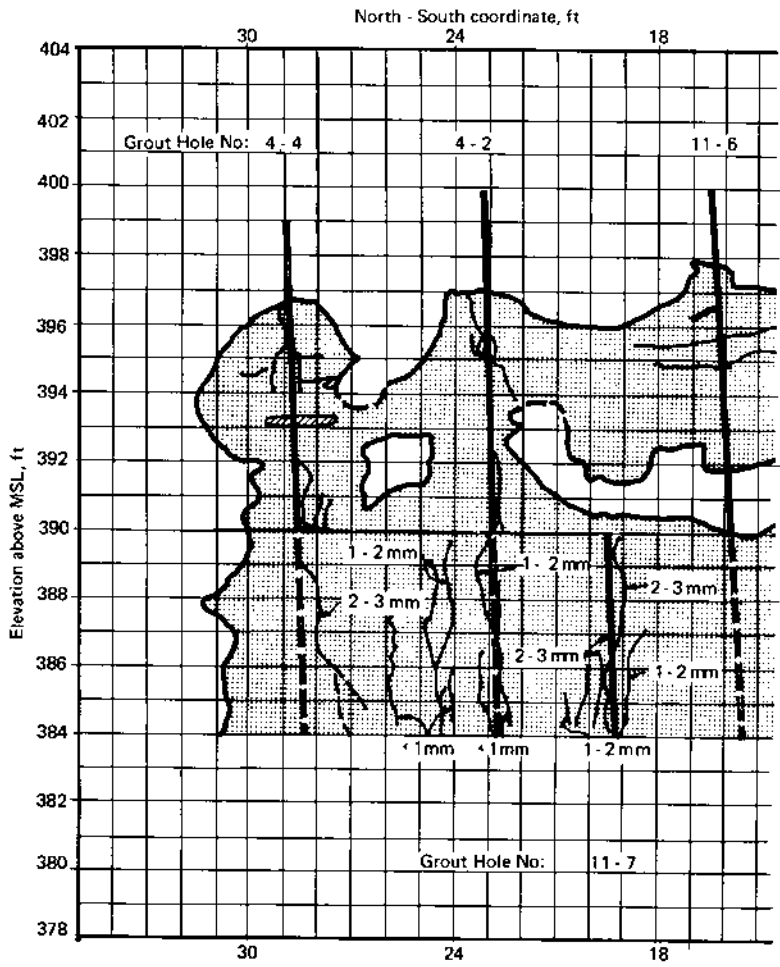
Vertical section through test area. (From Ref. 2.)
